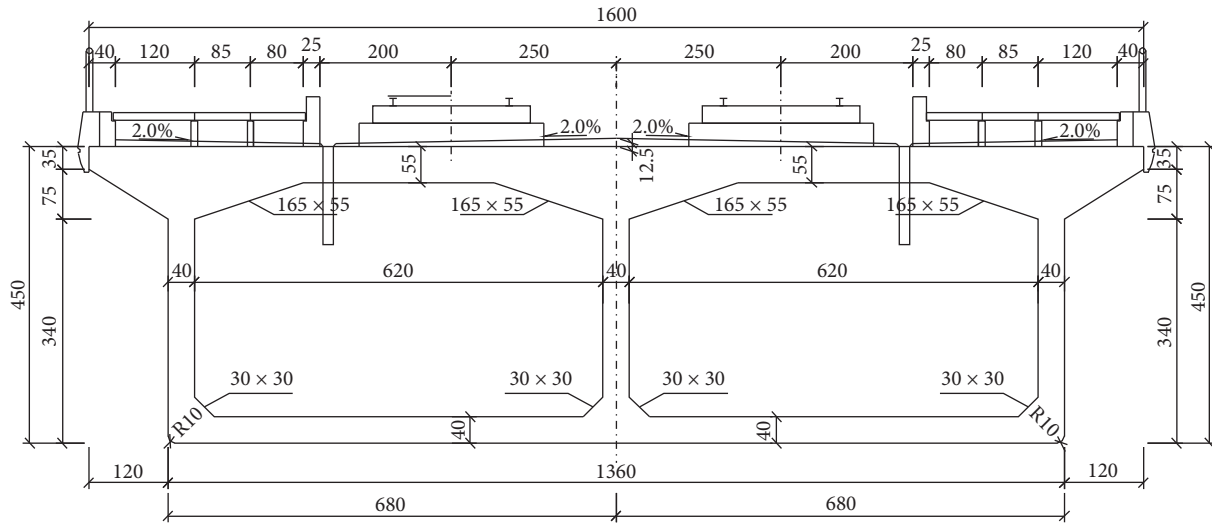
Cross-section of the Chengjiang bridge (unit: cm).
